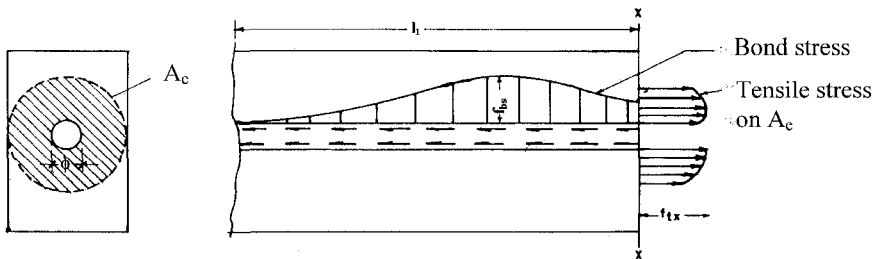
Bond and tensile stress distribution in concrete at a section distance  $l_1$  from a crack formed in a reinforced concrete member
